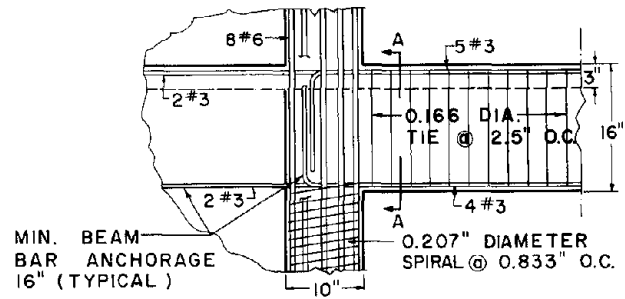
DIMENSIONS AND DETAILING OF THE 2nd STORY BEAM OF THE MODEL SUBASSEMBLAGE
